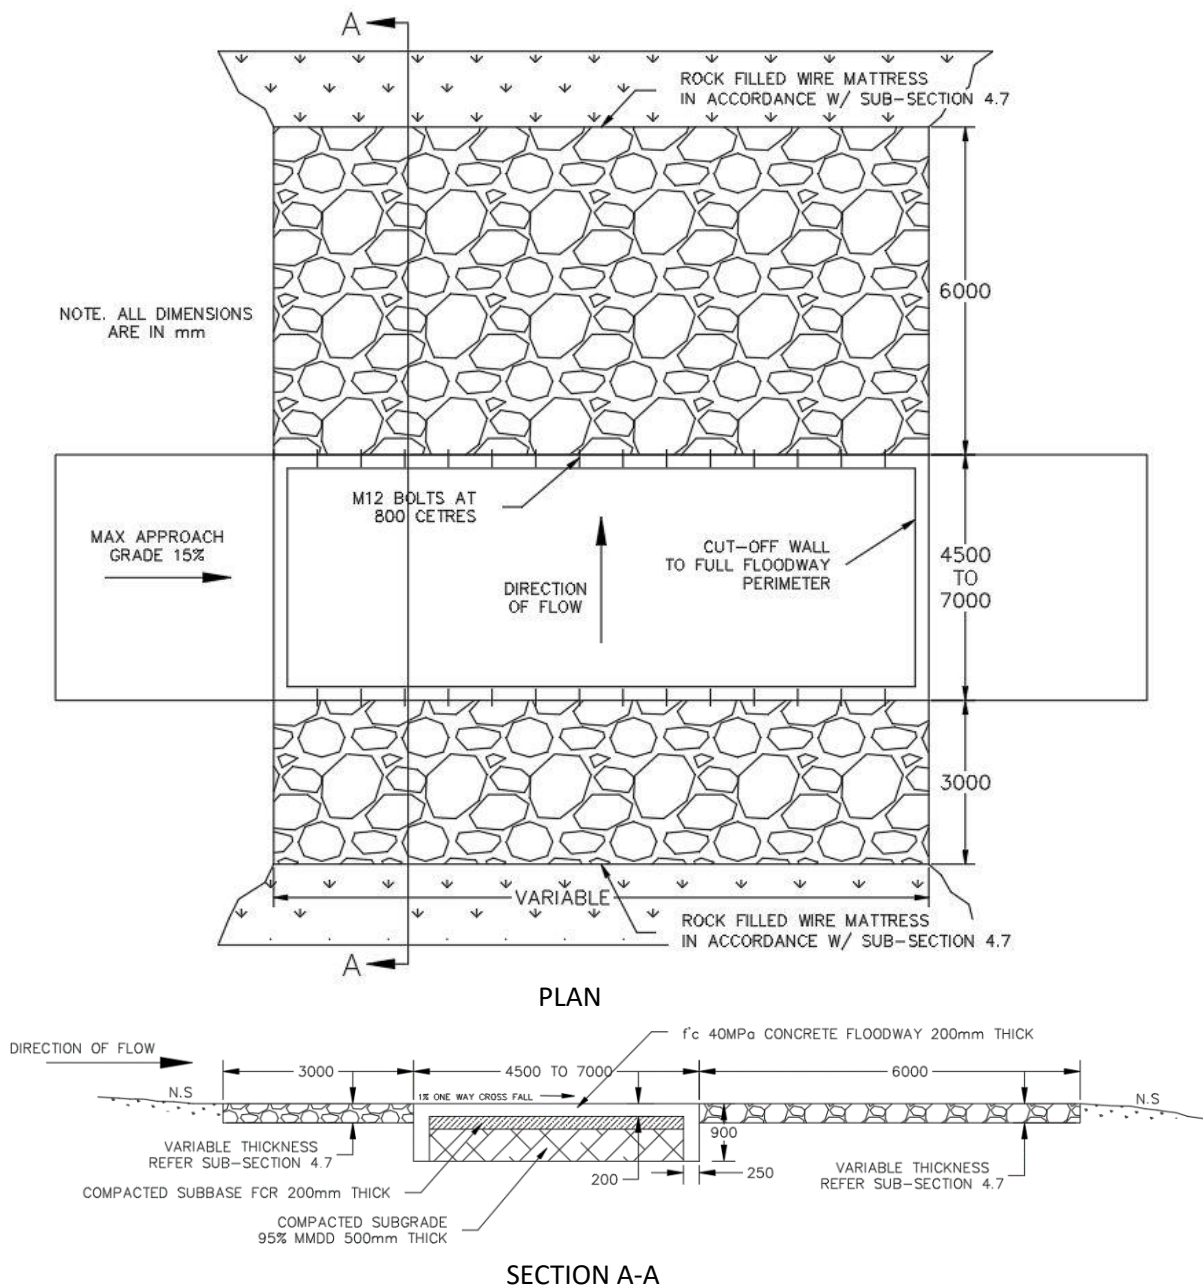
Floodway Type 1 details (LVRC 2008a).
